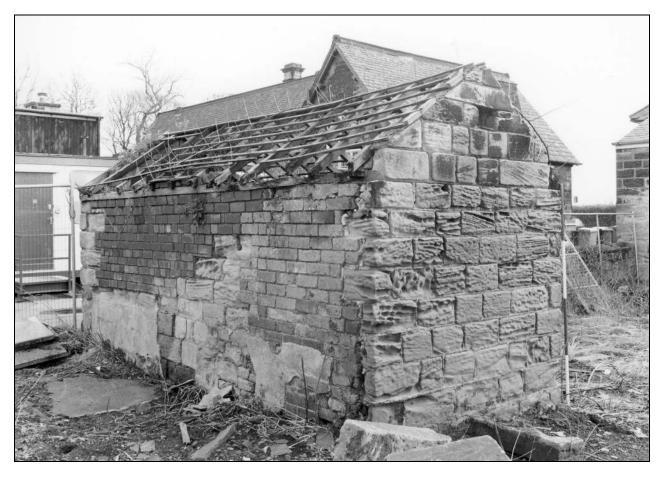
The outbuilding, from the north-west (film 3, frame 7)
